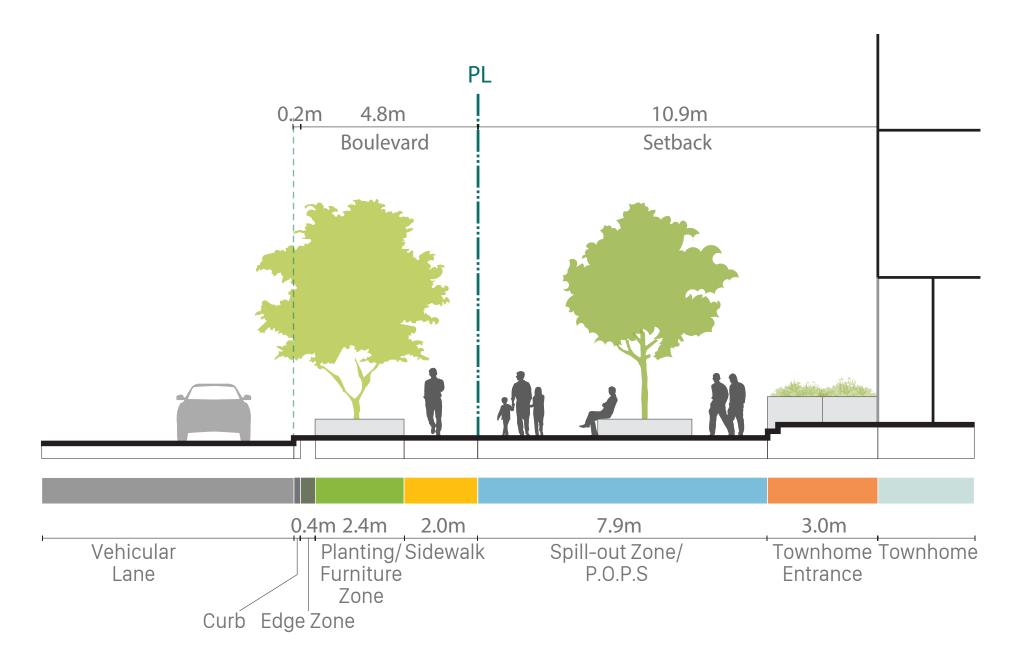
Section at interface of Subject Site and Poppy Drive East (Courtesy of SvN Architects + Planners)
